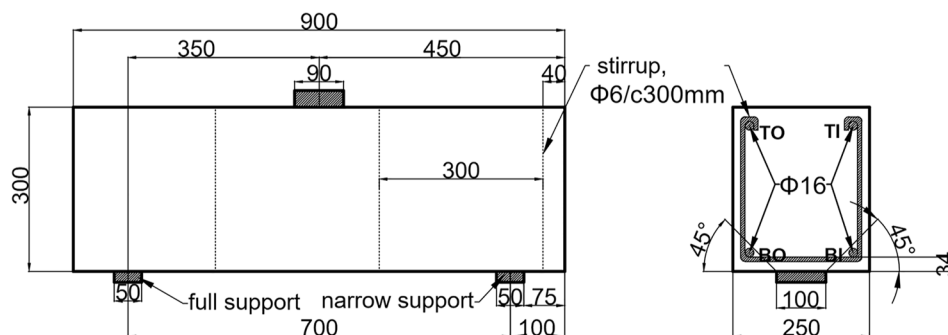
Test set-up and view of narrow support in the beam tests [11]. The beam shown was tested as positioned on the bridge. Measurements in mm.
